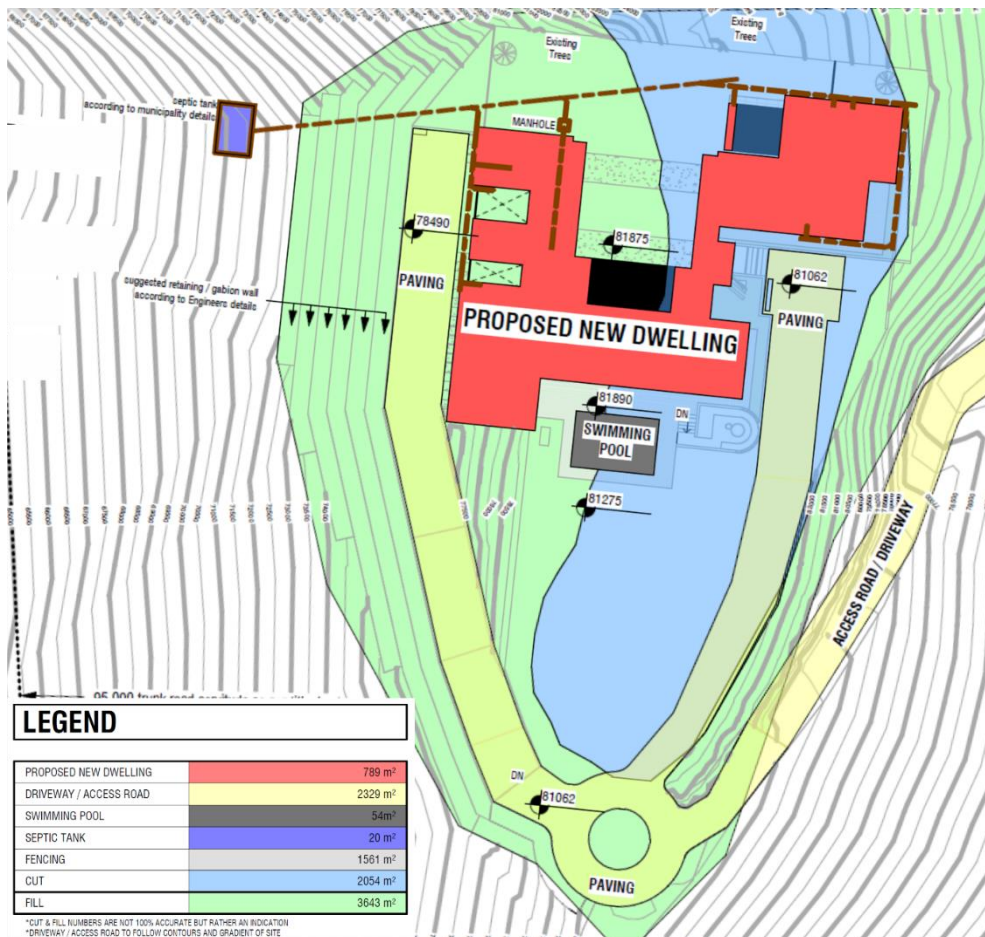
Proposed development plan excluding a large part of the access road on Erf 2924.
